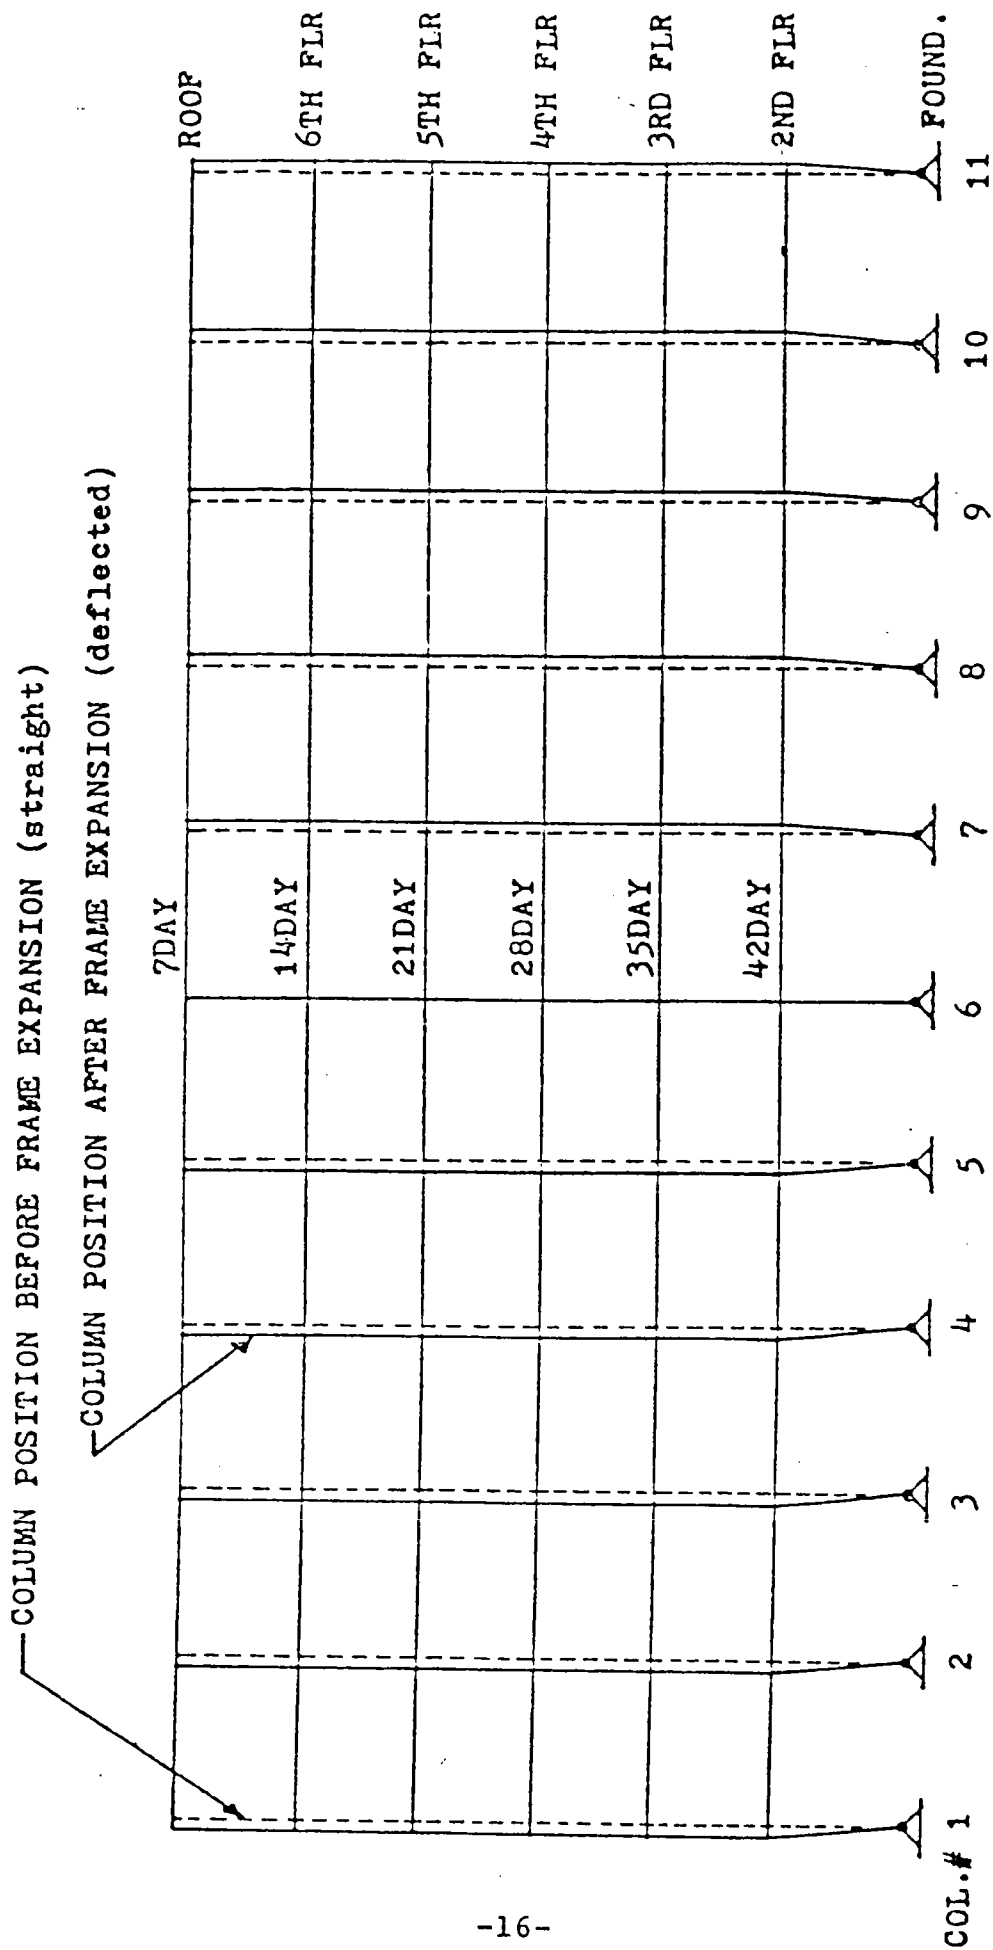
ELEVATION OF BUILDING FRAME AFTER EXPANSION HAS TAKEN PLACE
